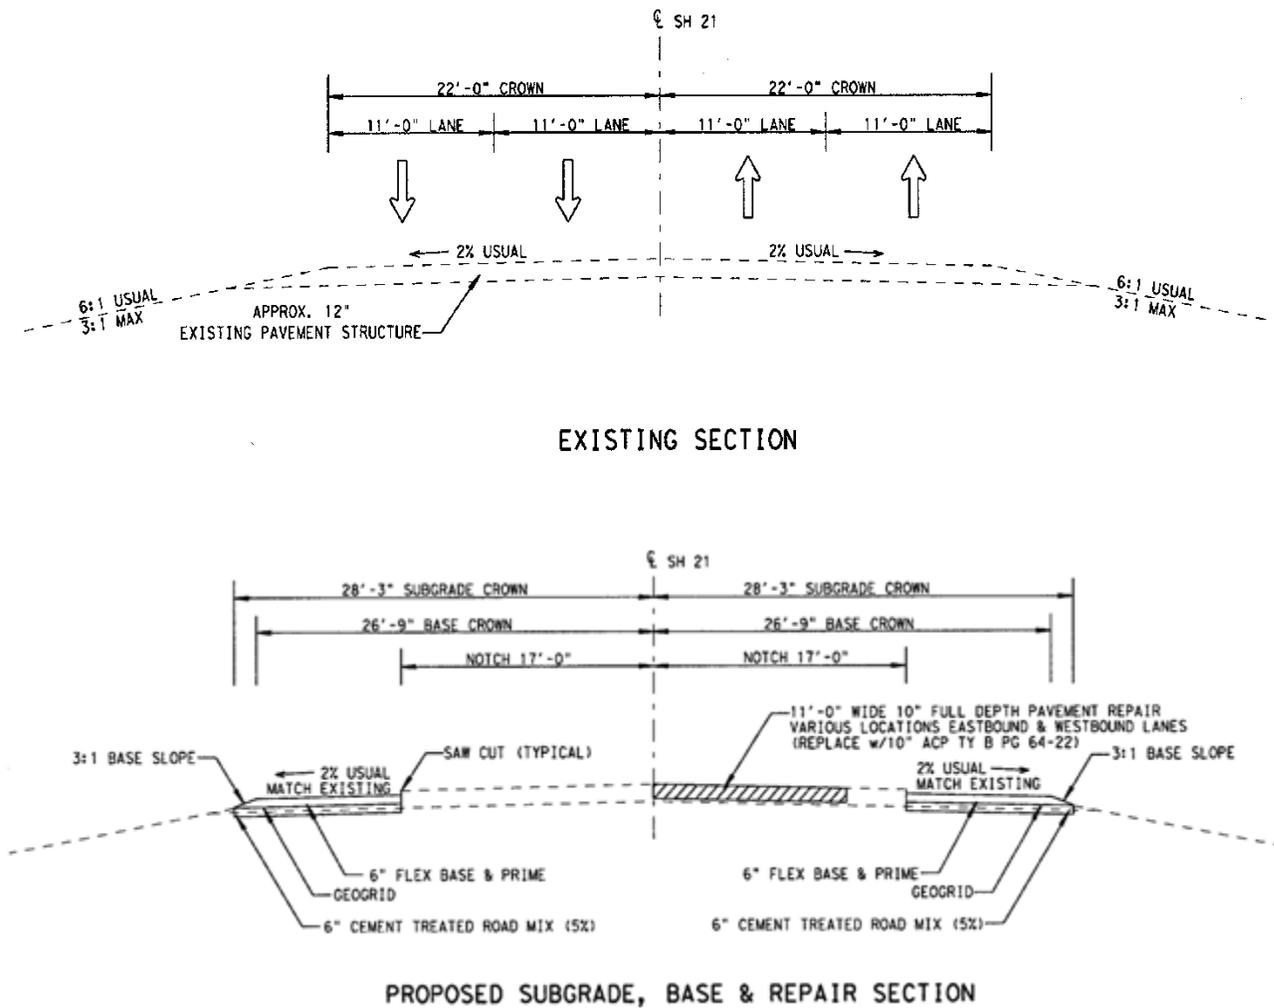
Existing and Proposed Sections on SH 21 from US 290 to FM 2440.
